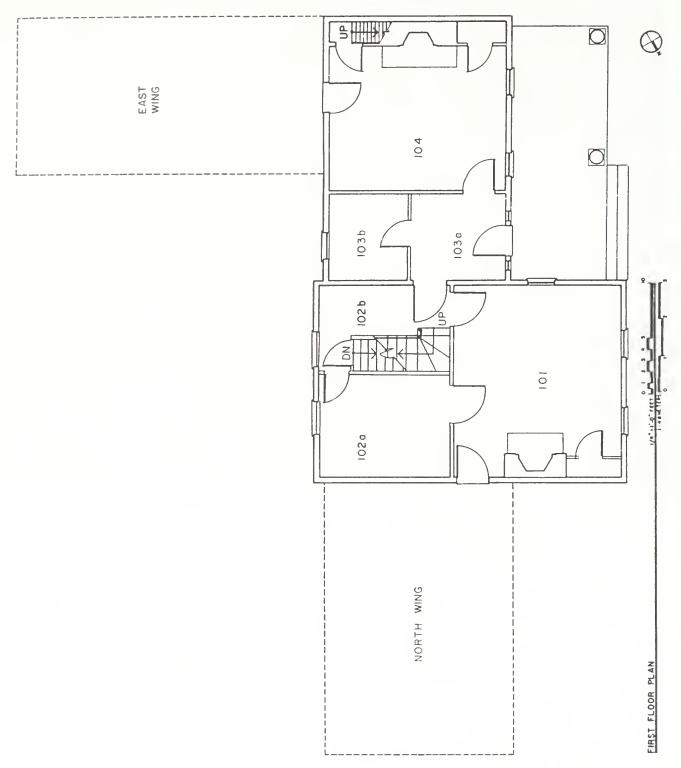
Conjectural first-floor plan of William Bayard's house, circa 1837.
